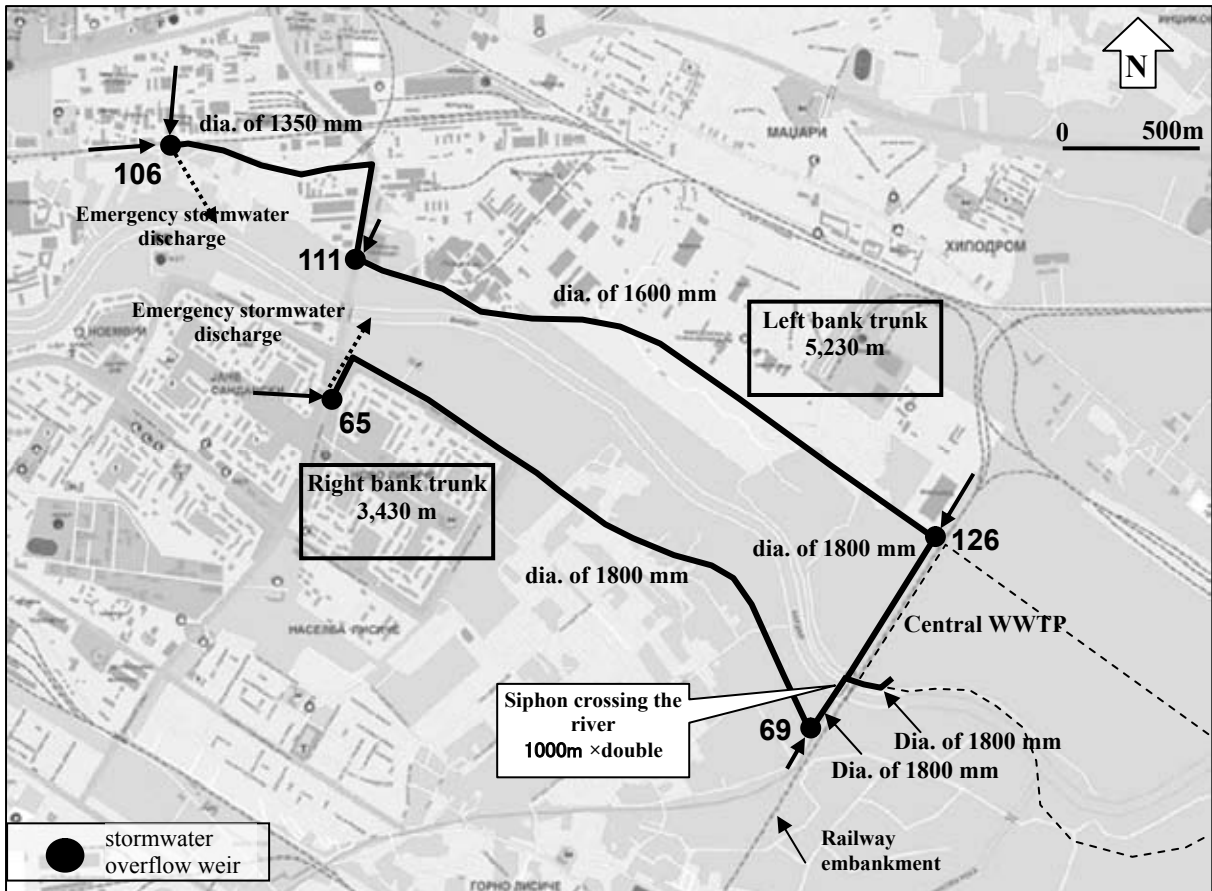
Layout Plan of Right Bank and Left Bank Side Trunk Sewer
